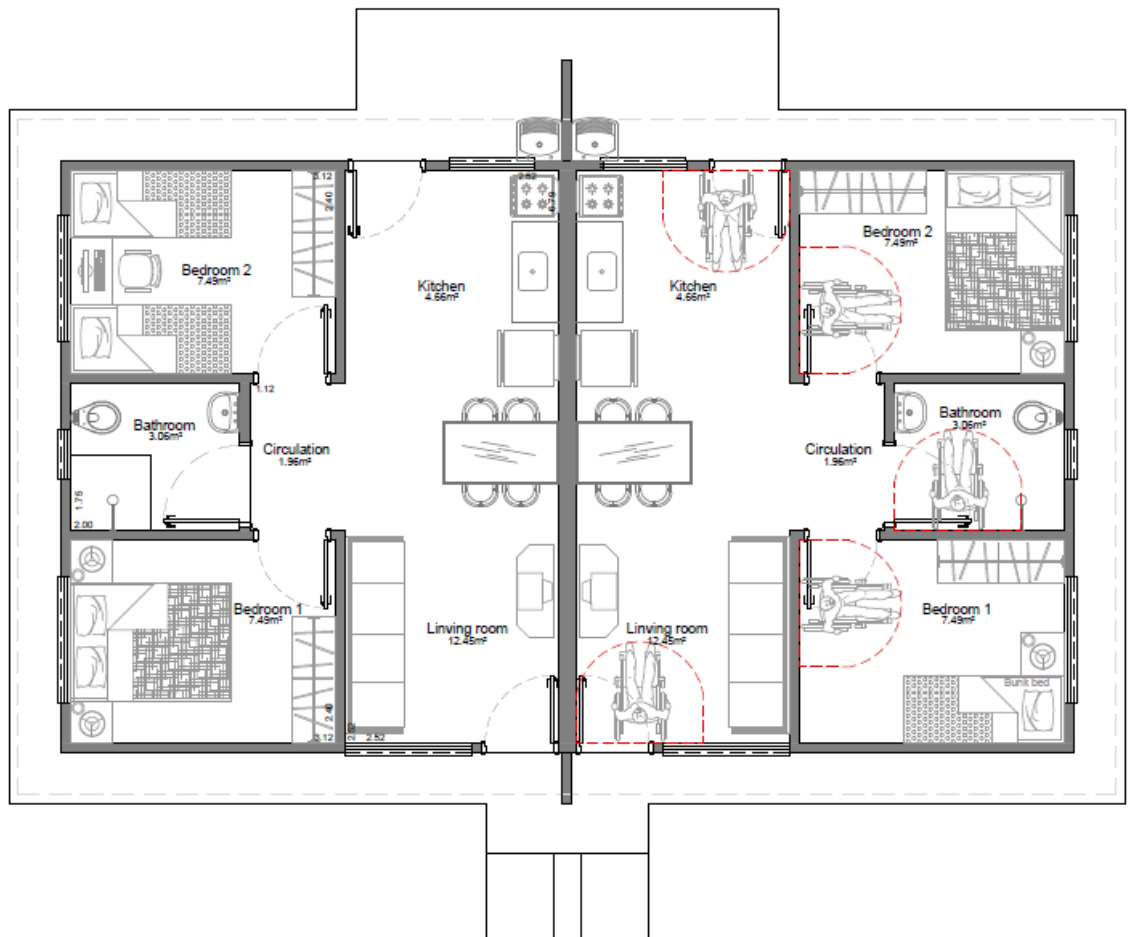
Floor plan of a standard house of Ary Abussafi De Lima and Gregorio Correa.
